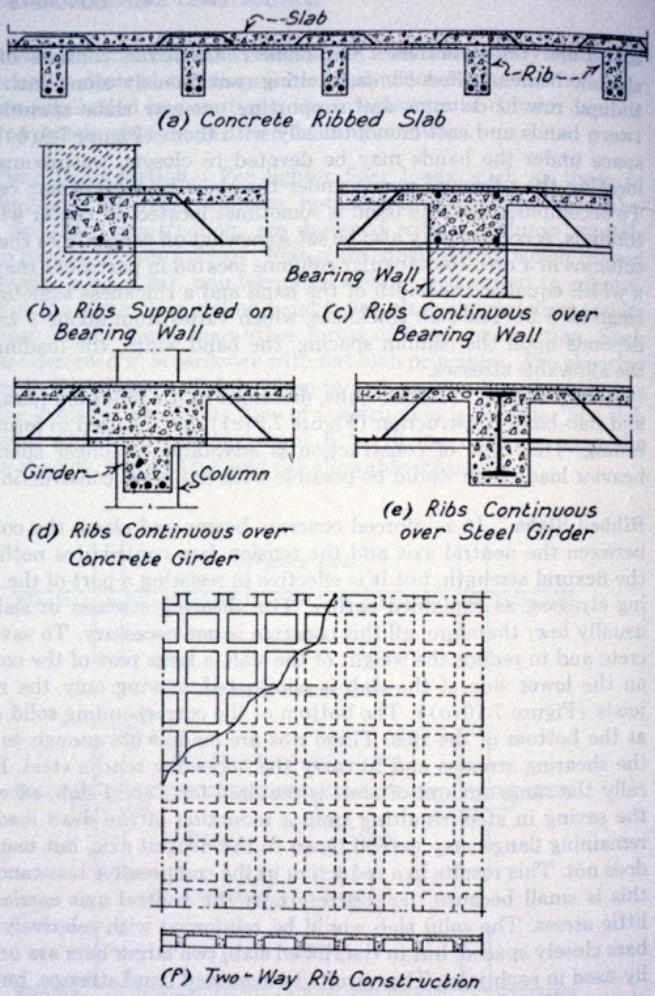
Ribbed slabs of reinforced concrete.
